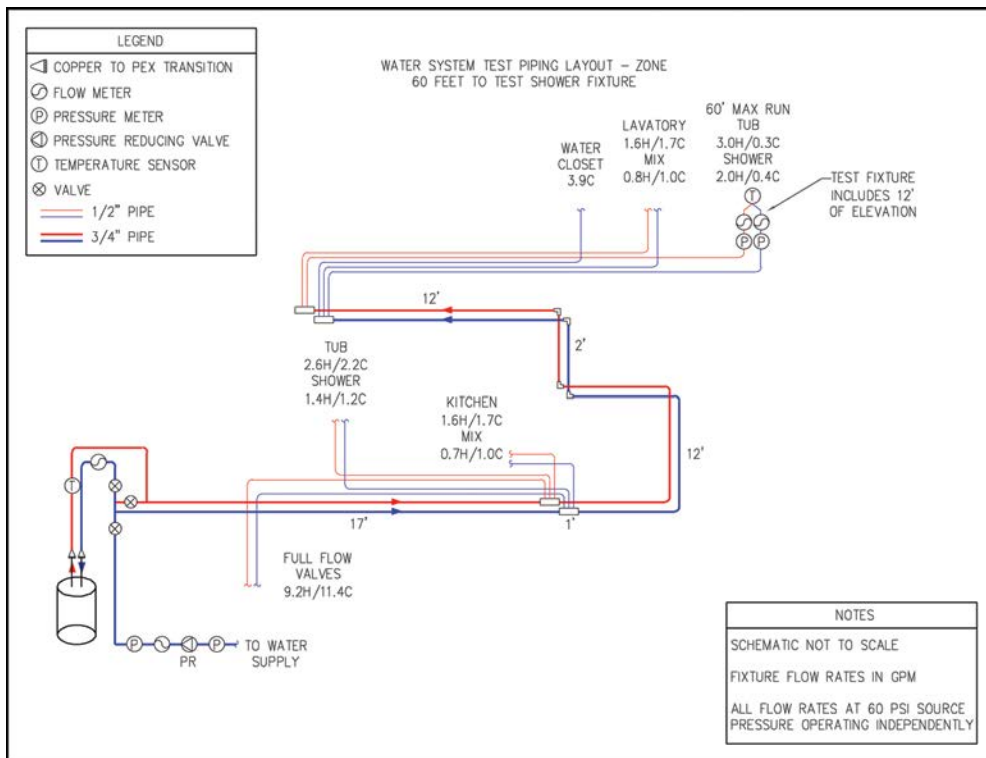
Water System Test Piping Layout – Zone, 60' to TF
